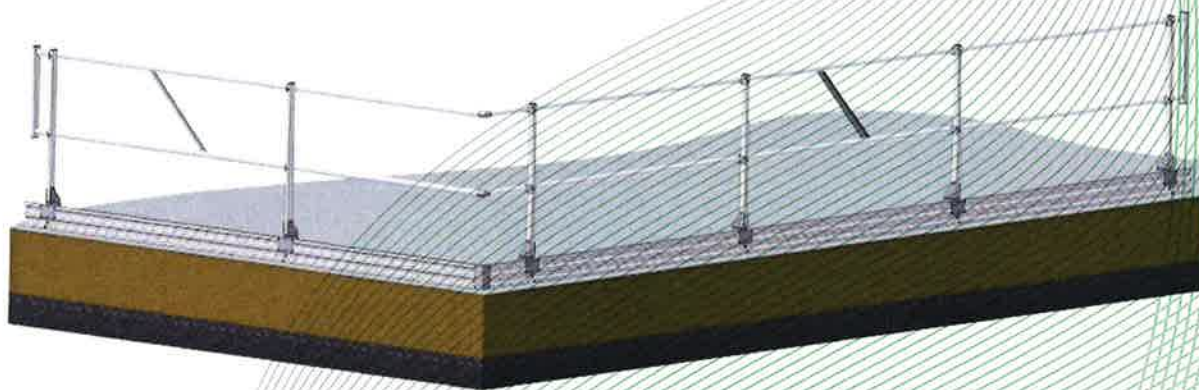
LUX-top® G-T DIREKT WD II, to bypass heat-insulated surfaces (assembly example), here with board plate
